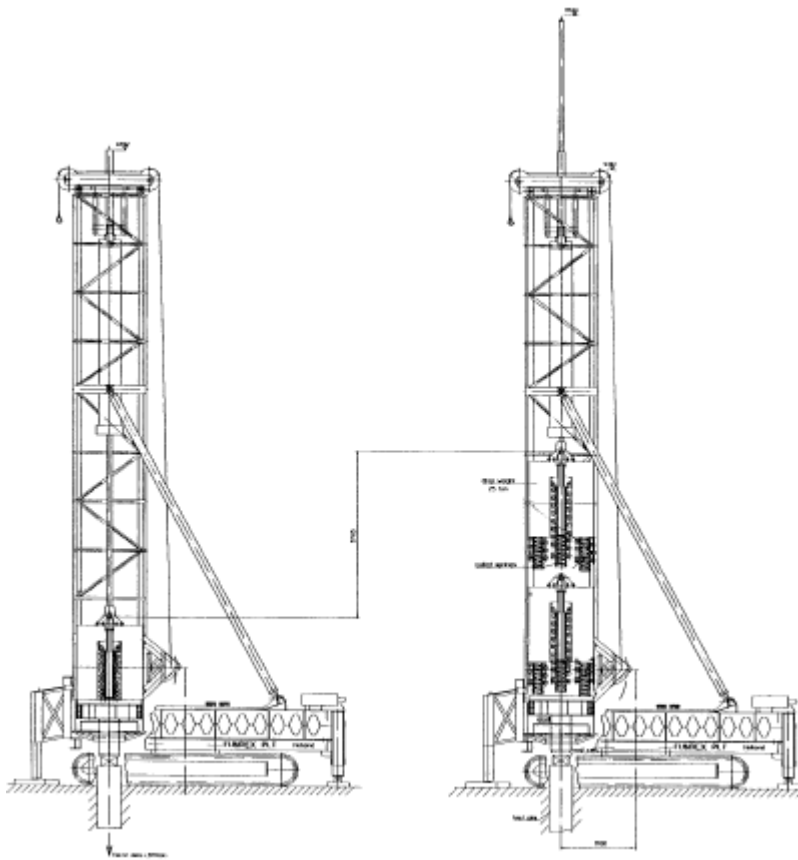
Drawing of the Pseudo Static Pile Load Tester (Schellingerhout and Revoort, 1996).
